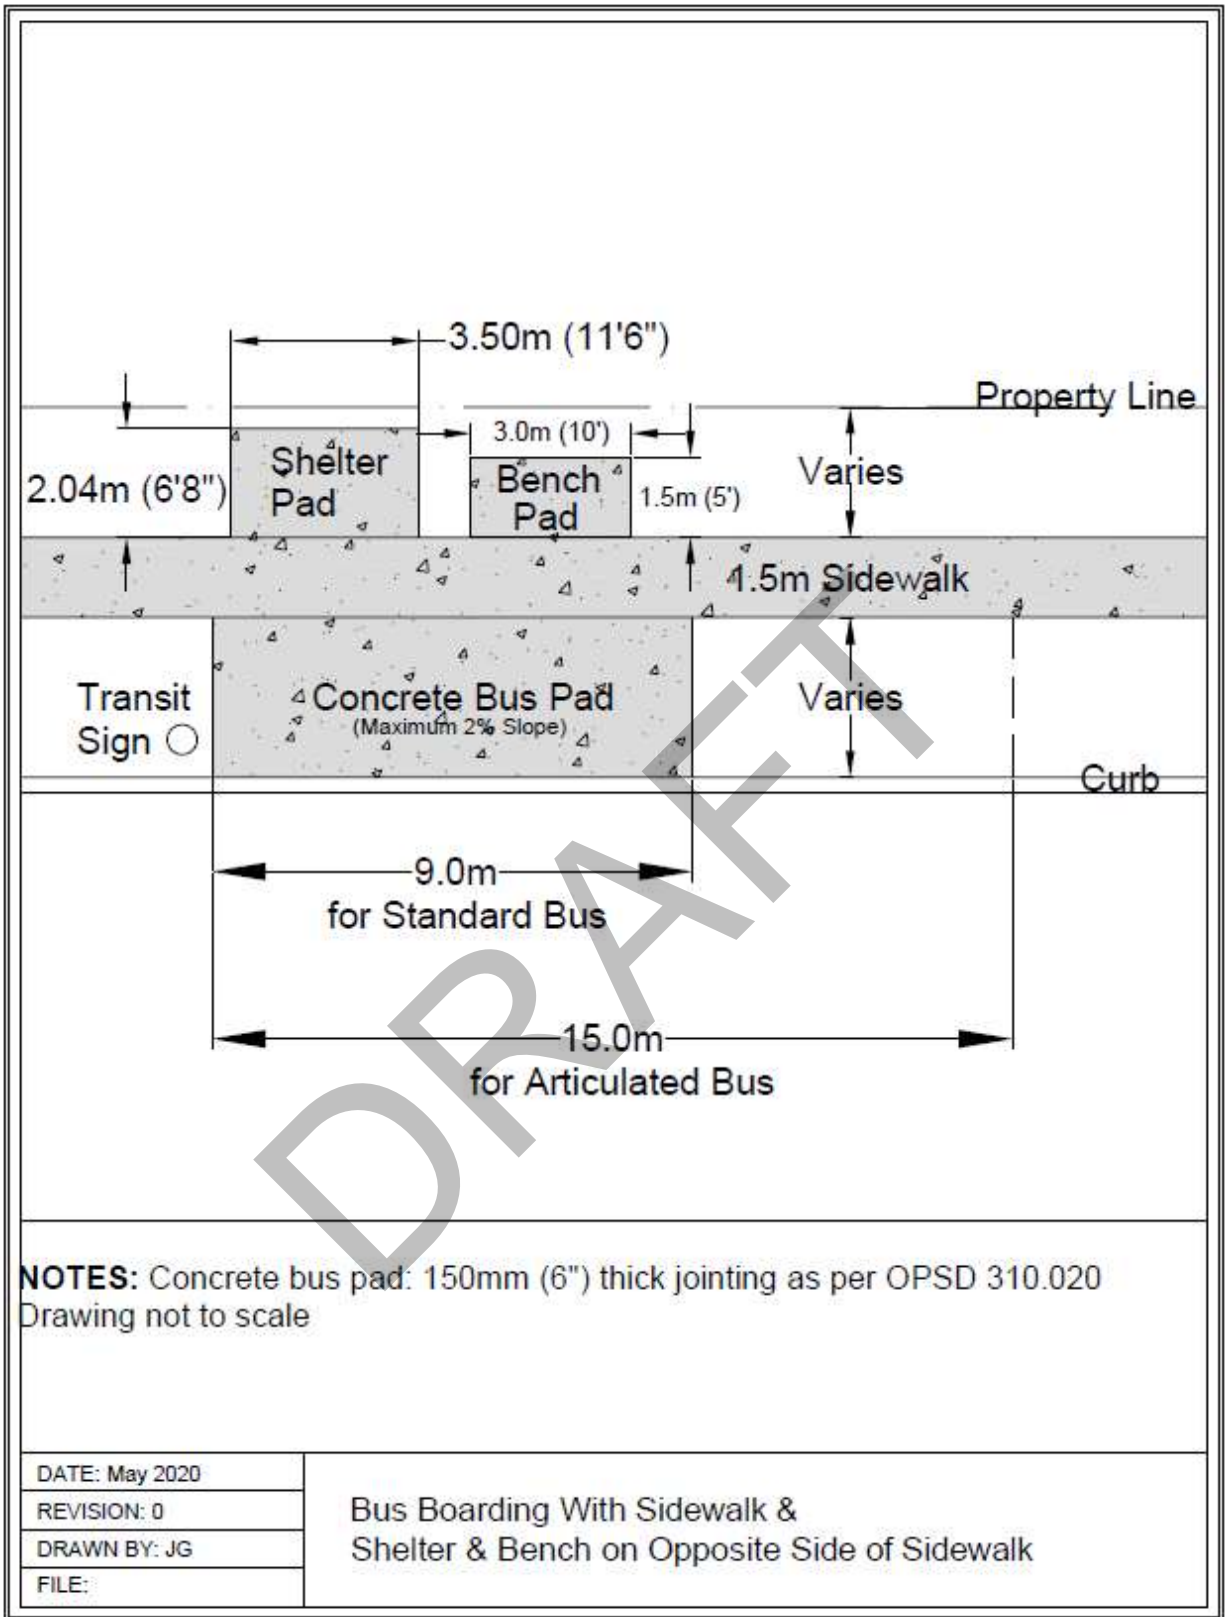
Diagram of bus boarding with sidewalk, shelter and bench on opposite side of sidewalk.
